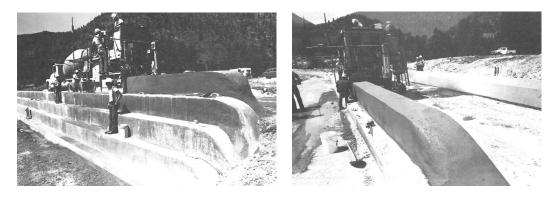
Construction of slip-formed facing elements at the test placement for Upper Stillwater Dam.
